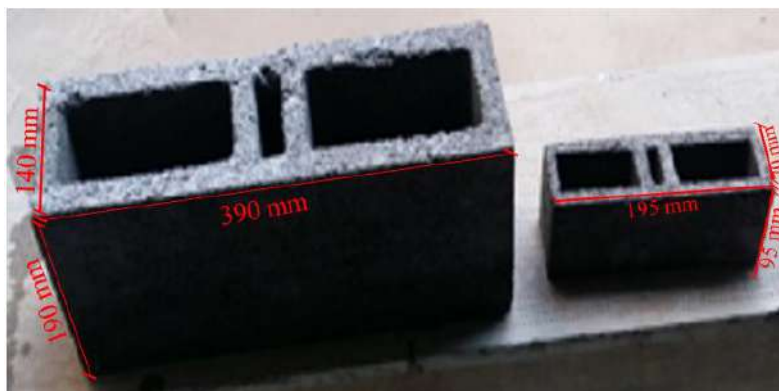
Typical concrete masonry unit (full-scale and half-scale)
